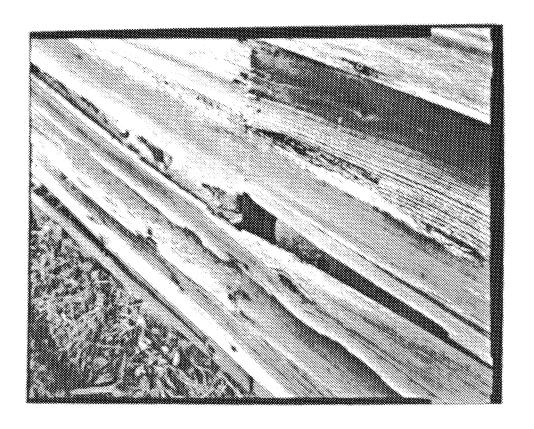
Grasslands Quarter, detail of siding on southwest elevation, looking east.
